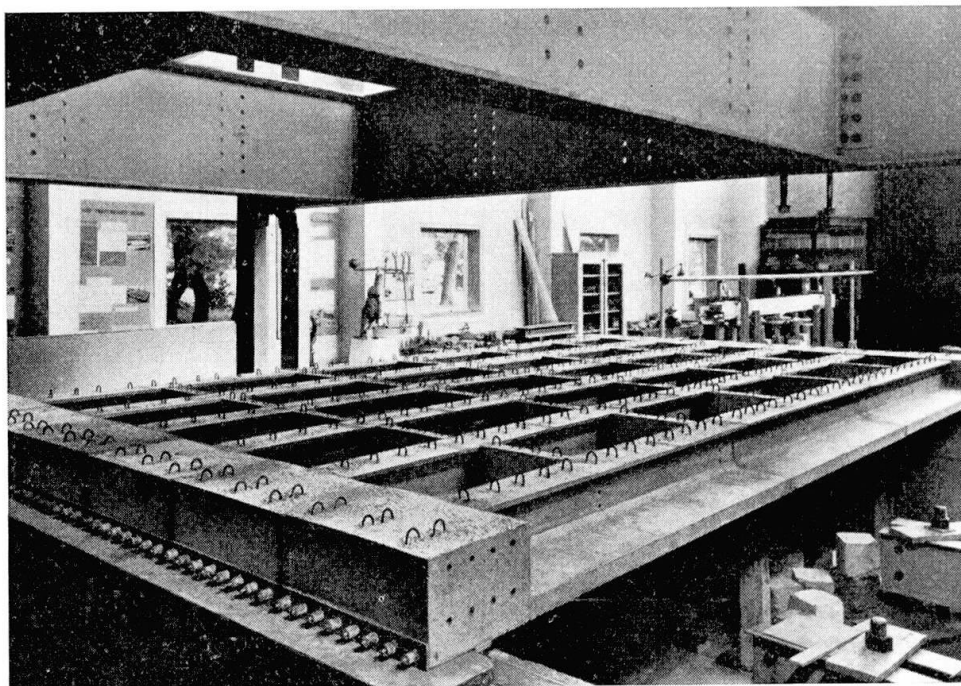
Box-Section Bridge — Six Main Beams and Diaphragms After Jointing.
